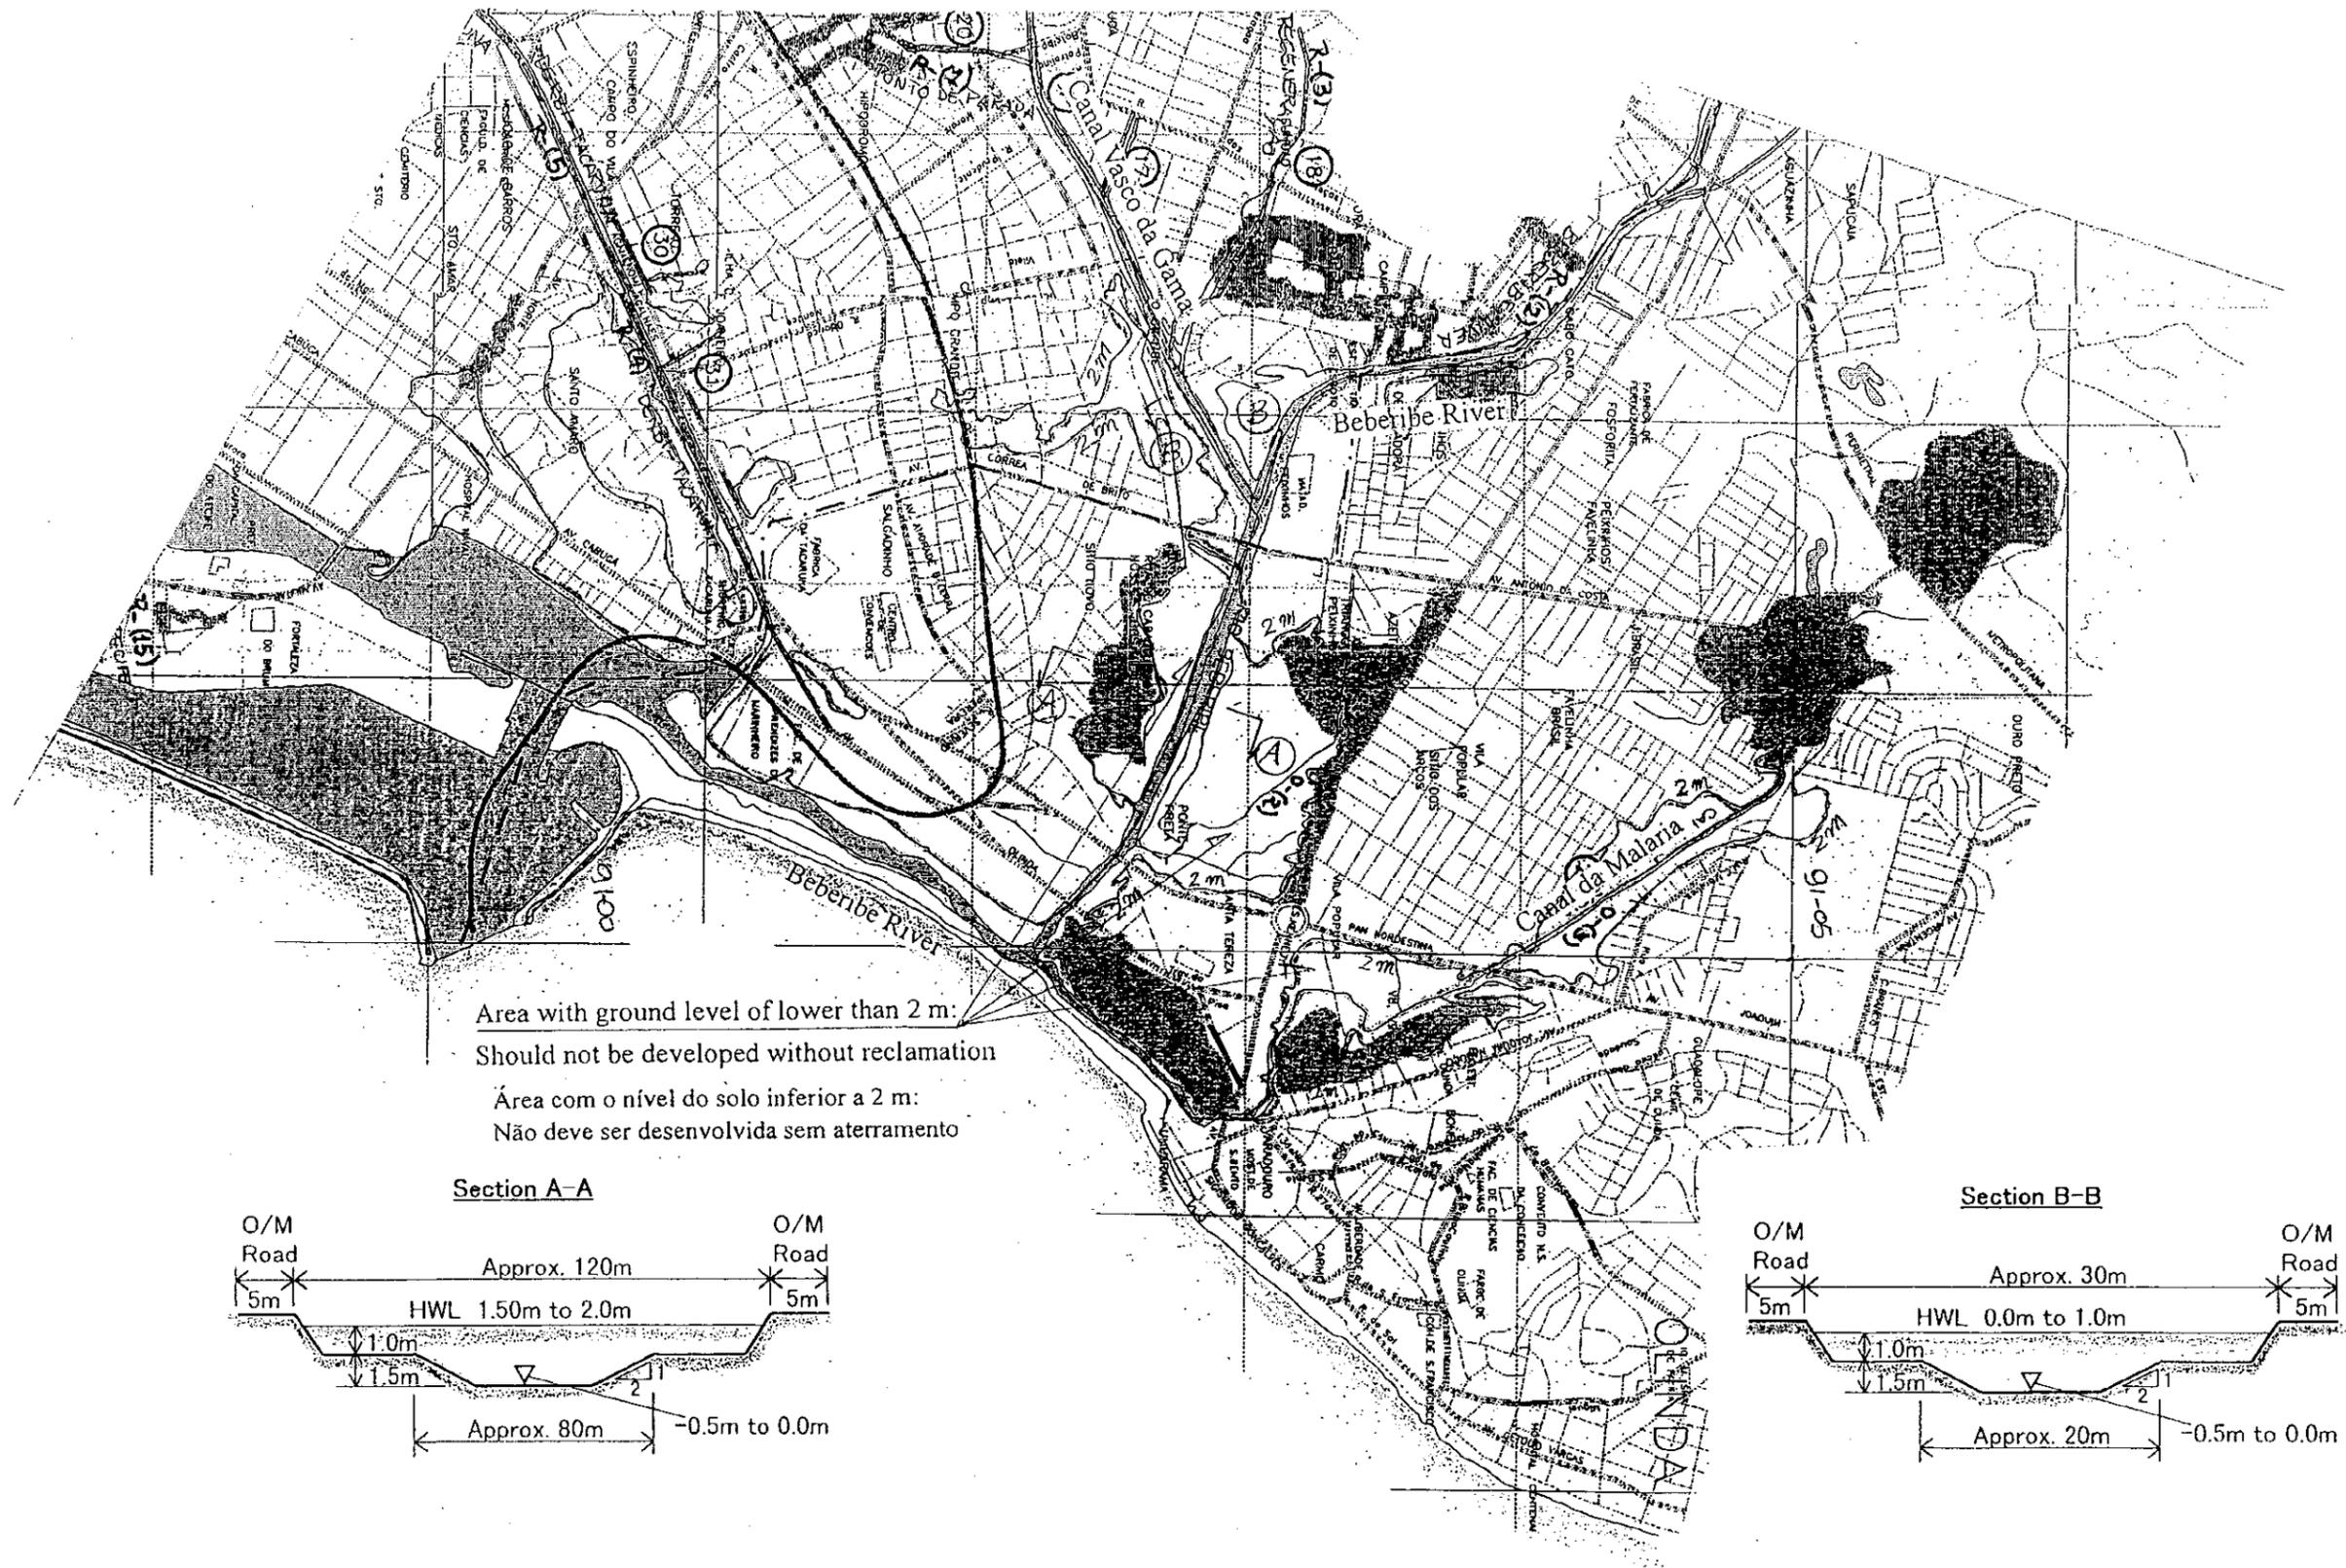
(1/2) Concept of Drainage Improvement Plan for Beberibe River System
